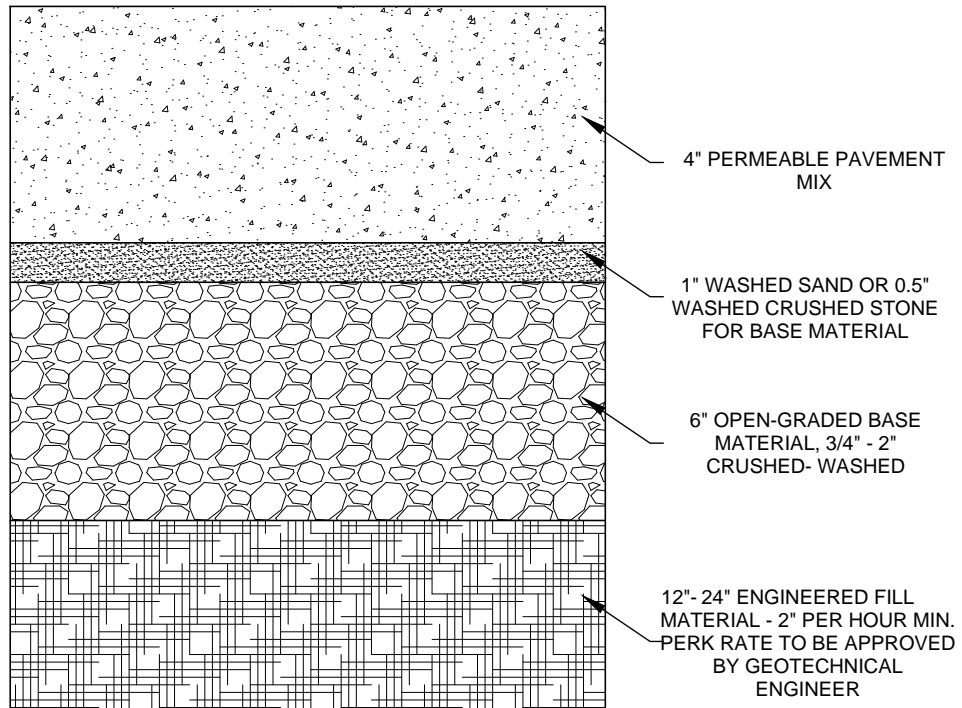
DOE Figure V-5.3.4 Example of Permeable Pavement
